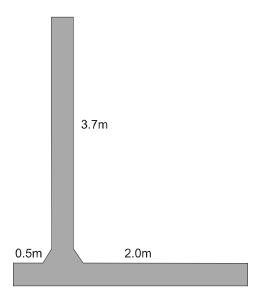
Example of how pre-cast concrete slabs can be used alternative to sheet piling of the breakwater and quay wall. The technique is commonly used in the Maldives instead of cement-bagged breakwaters.
